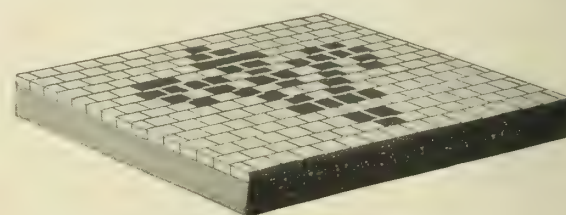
SECTION OF TILE LAID IN PLICARO CEMENT
